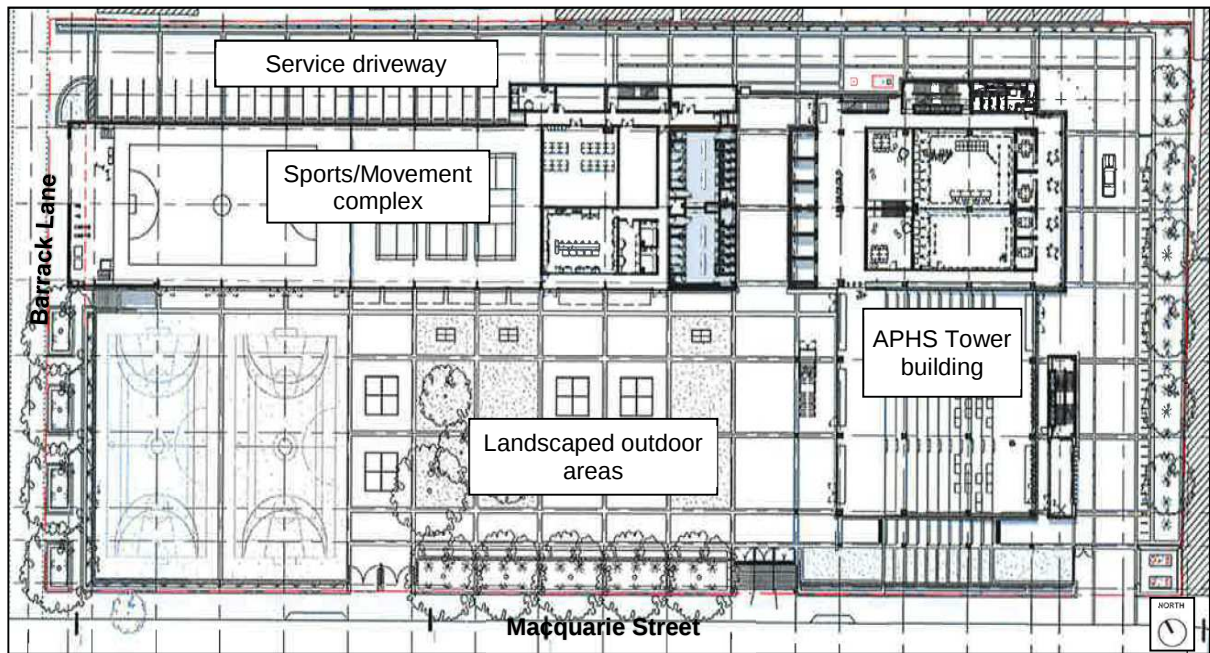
Approved APHS Ground Floor Plan (Source: DPE)
